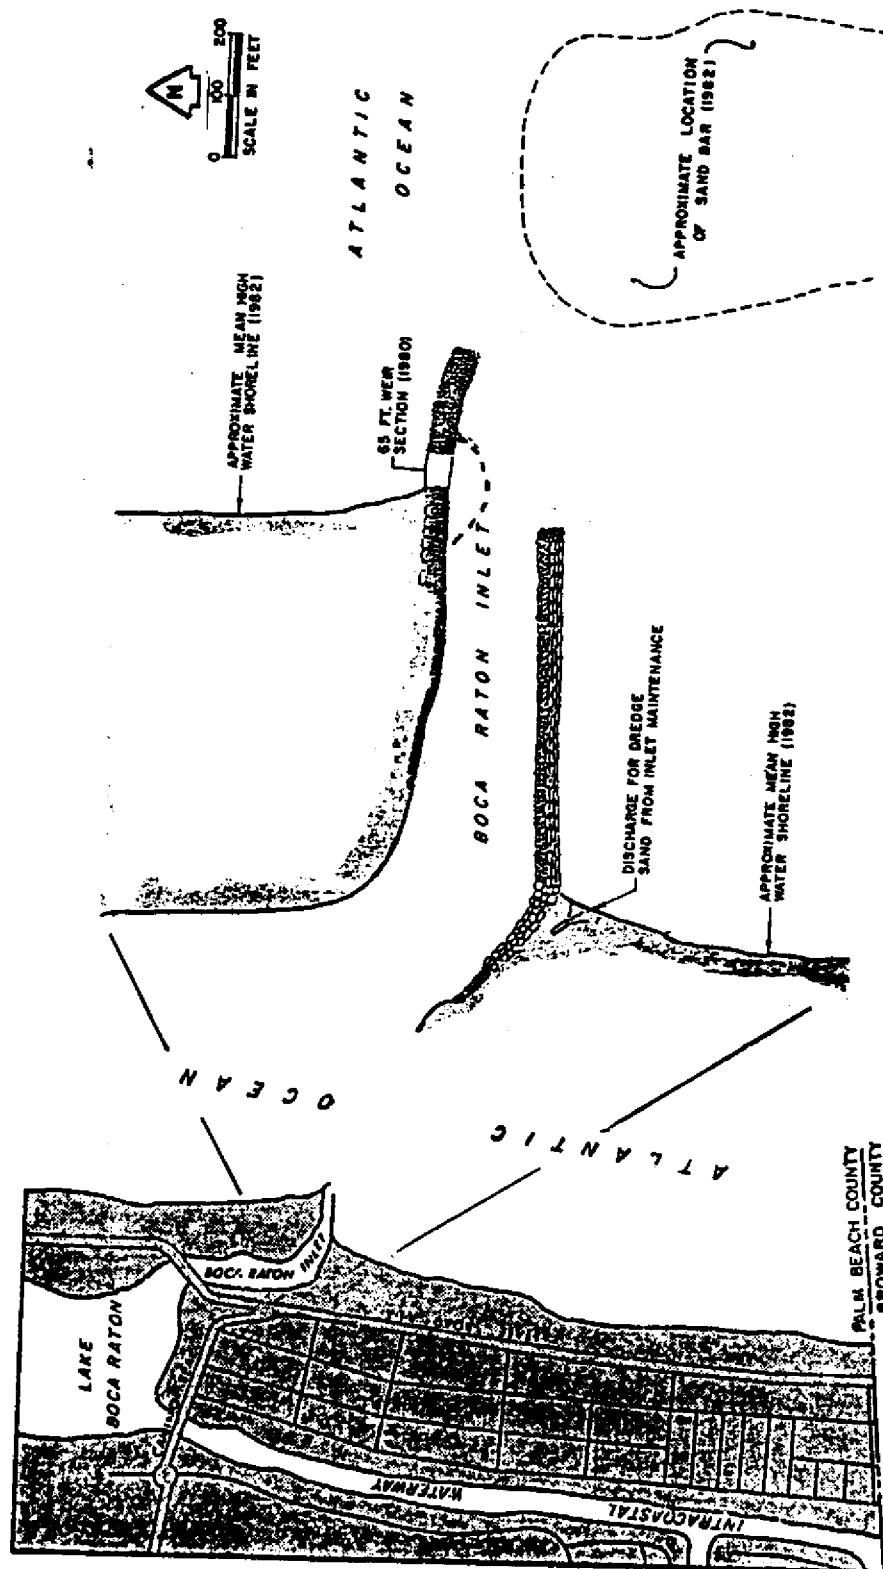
Boca Raton sand bypass project dimensions, showing location of weir at the north jetty and adjacent sand trap. Dredge pumps from sand trap, inlet channel and offshore sand bar to the discharge pipe located on the south beach (after Strock and Assoc., 1981c).
